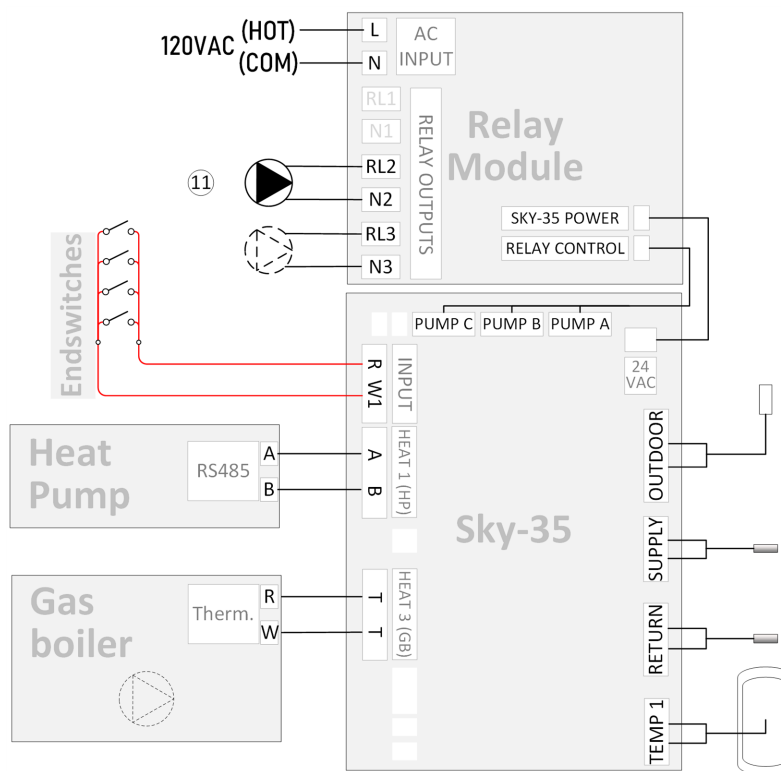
Concept drawing: Heat pump with backup gas combi boiler / water heater
